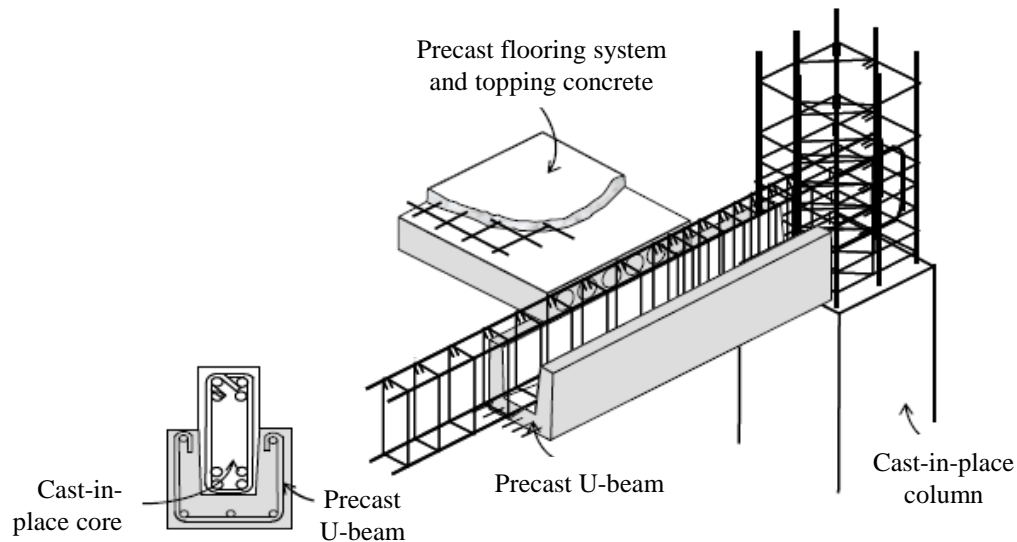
U-beam detail for precast frames (adapted from [6] and [36]).
